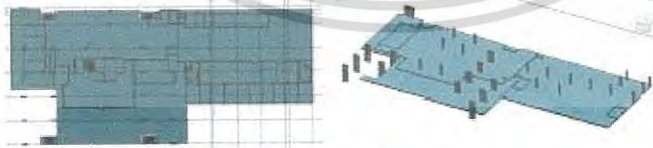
Architecture drawing 1<sup>st</sup> Floor Plan and 3D view
